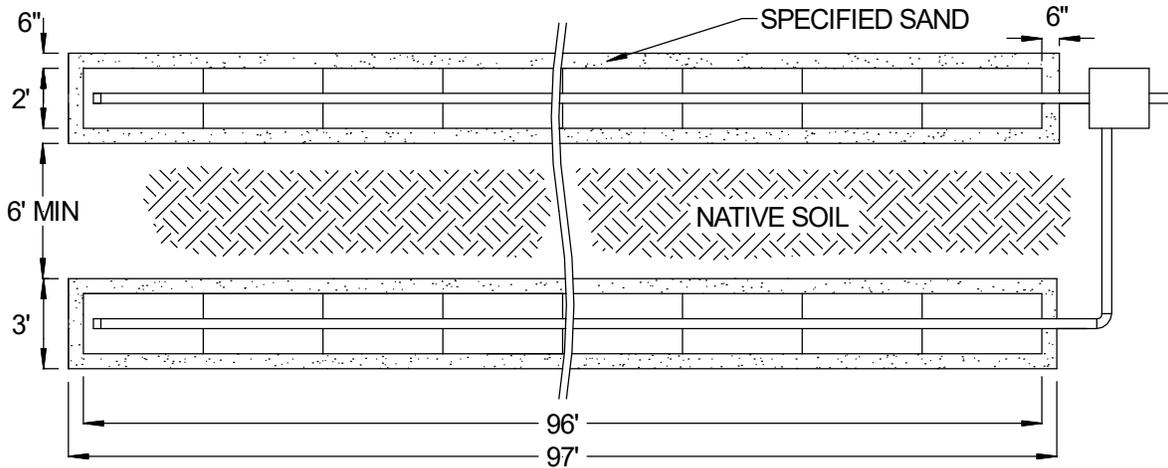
SECTION VIEW – TRENCH SYSTEM – LEVEL SITE
